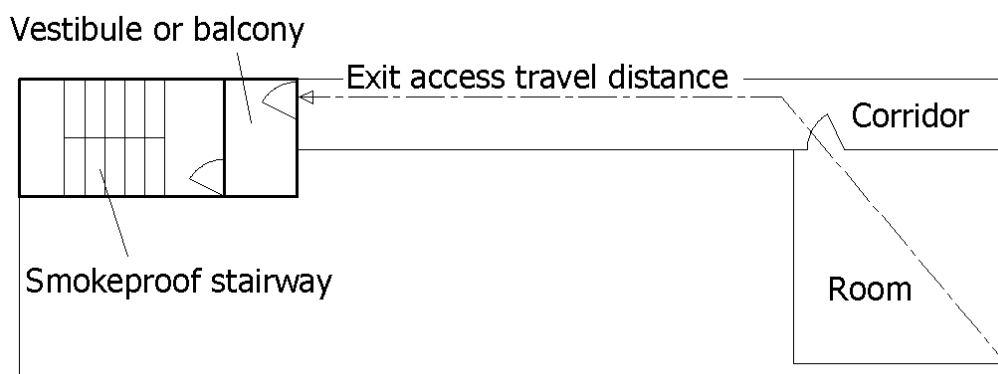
Maximum exit access travel distance (JICA, 2003).
